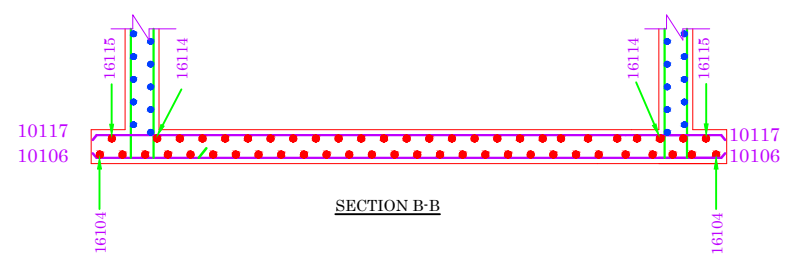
DETAILS OF REINFORCEMENT-FLOOR SLAB
